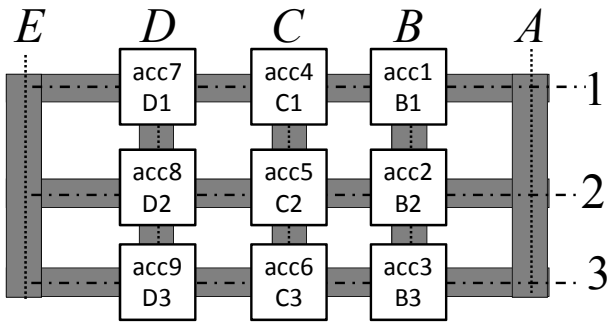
Details of bridge model for laboratory bridge monitoring system.
